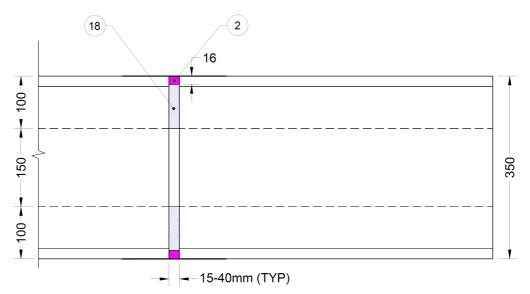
Service Panel Type 2 Joint Detail - Plan View
